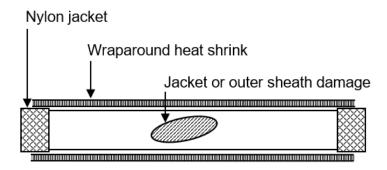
Jacket or Outer Sheath Repair of PVC Signal and Power Cable
